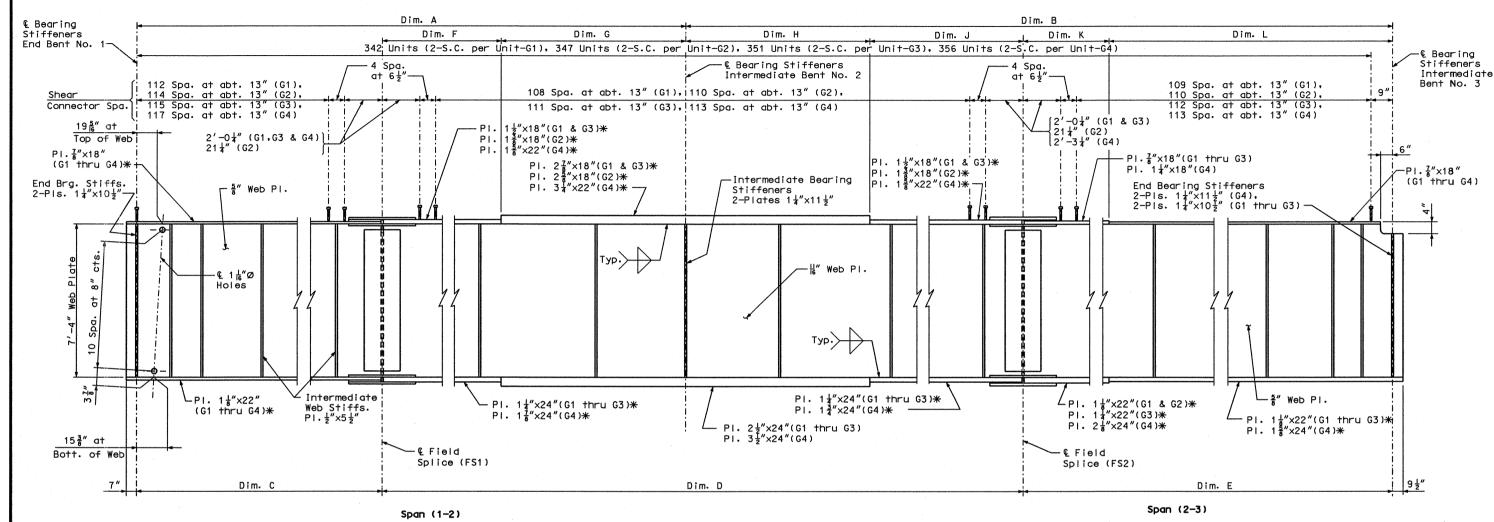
DETAILED: EAK JUNE 2005 CHECKED: GJD NOV. 2005 JACOBS CIVIL INC. ST. LOUIS, MO. FRAMING PLAN AND LONGITUDINAL SECTION - UNIT 1
